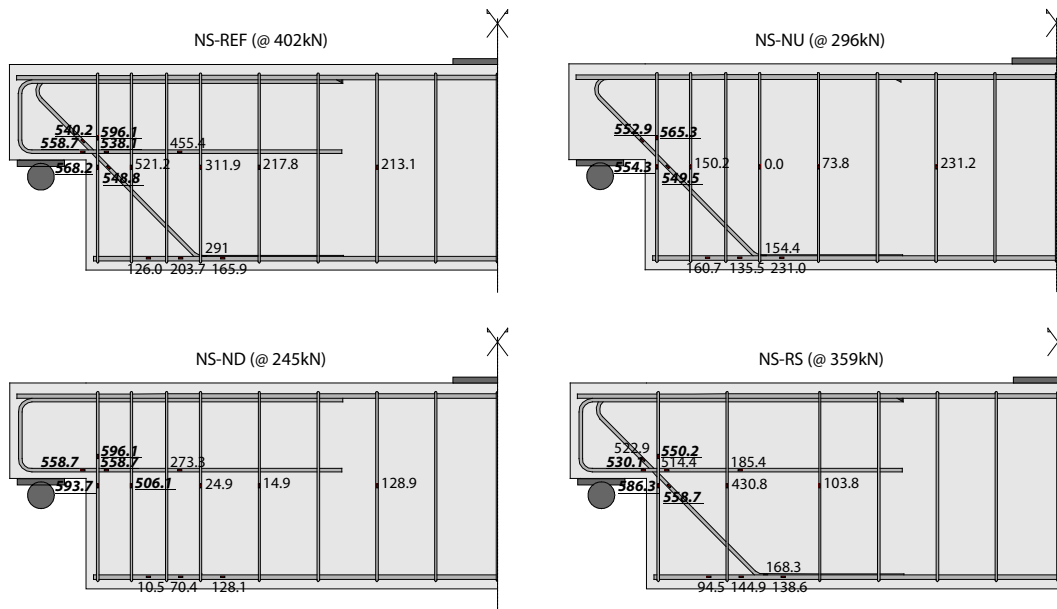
Mean reinforcement bar steel stresses at failure load.
